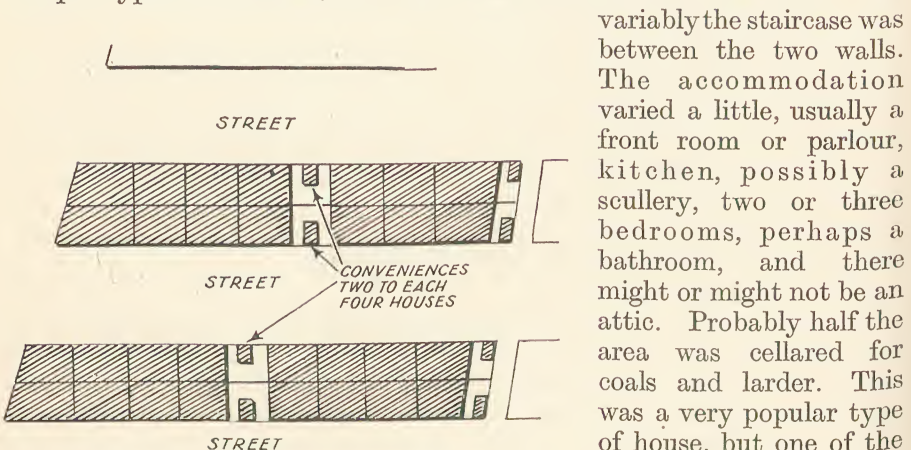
LAYOUT OF BACK-TO-BACK HOUSES
